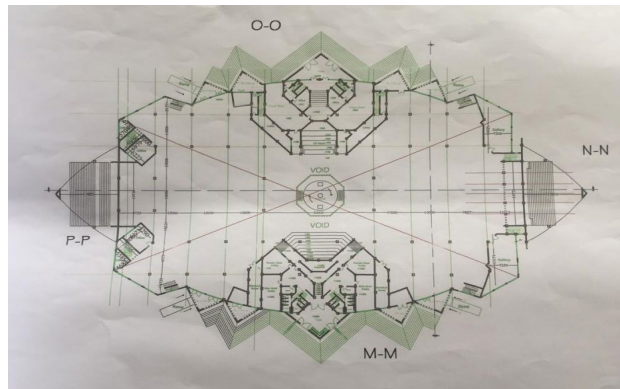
First Floor Plan - Government Ecumenical Centre, Igbogone
